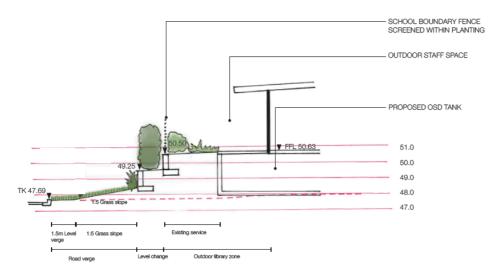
Section detail showing retaining walls on western boundary Source: Group GSA
